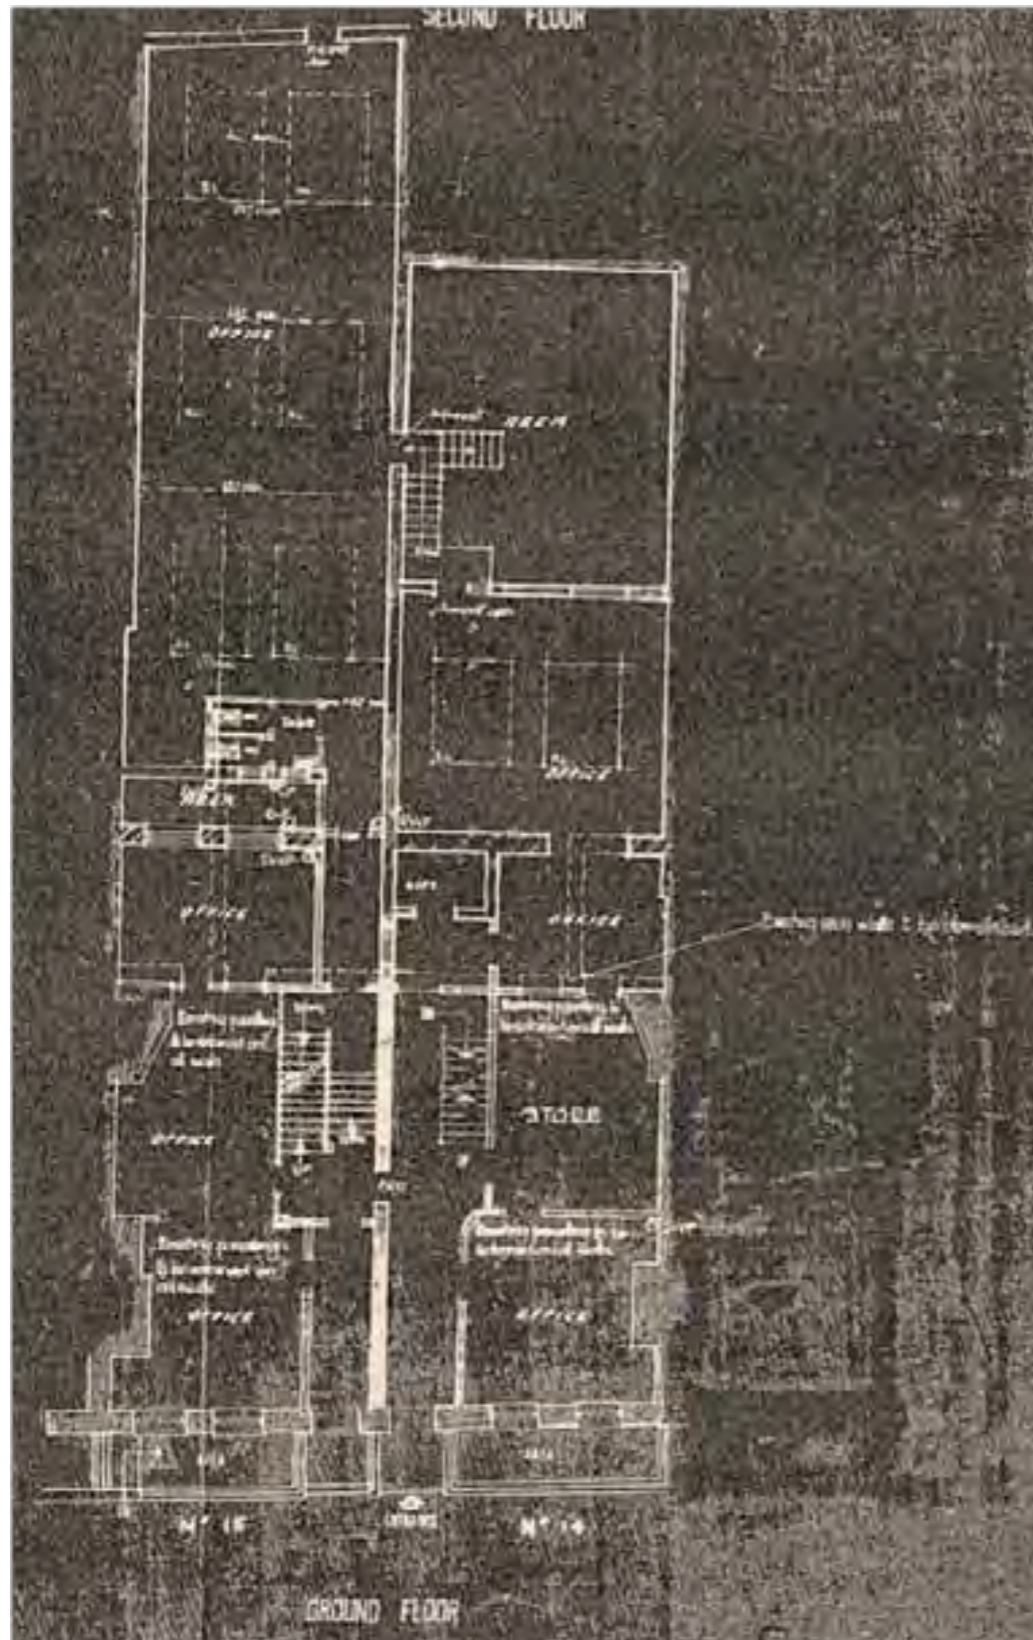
APRIL 1965 DRAWING FOR NOS. 14 AND 15 GREAT JAMES STREET, GROUND FLOOR (SOURCE: CAMDEN LOCAL STUDIES LIBRARY AND ARCHIVE).
